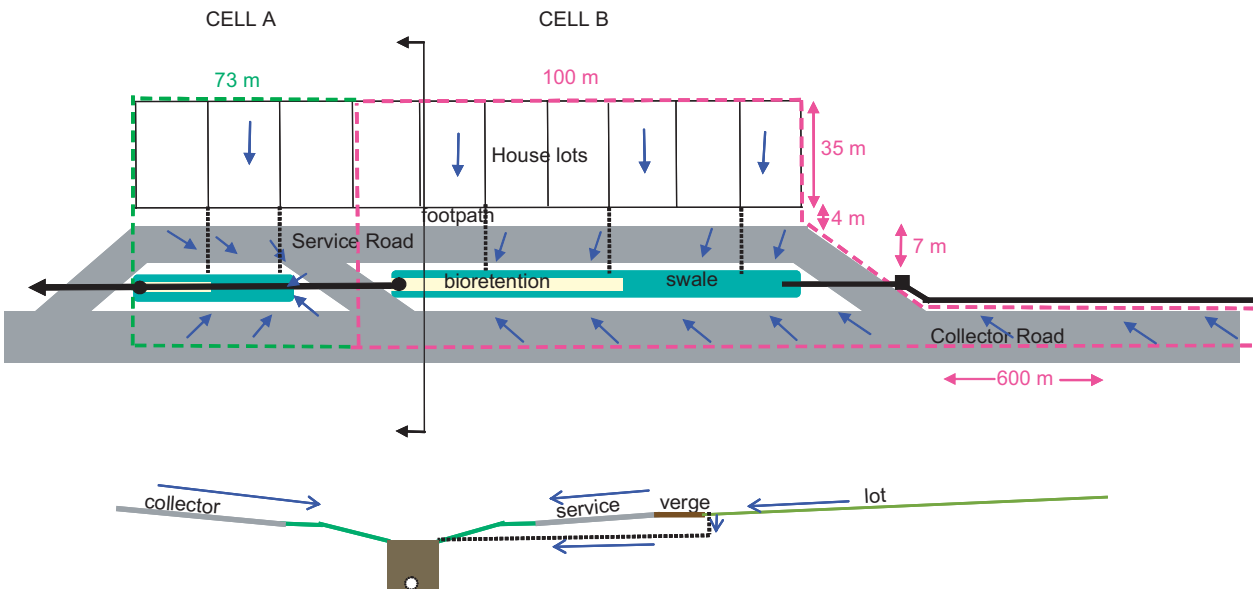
Catchment area layout and section for worked example of a stormwater quality treatment system for a residential estate in Melbourne.
